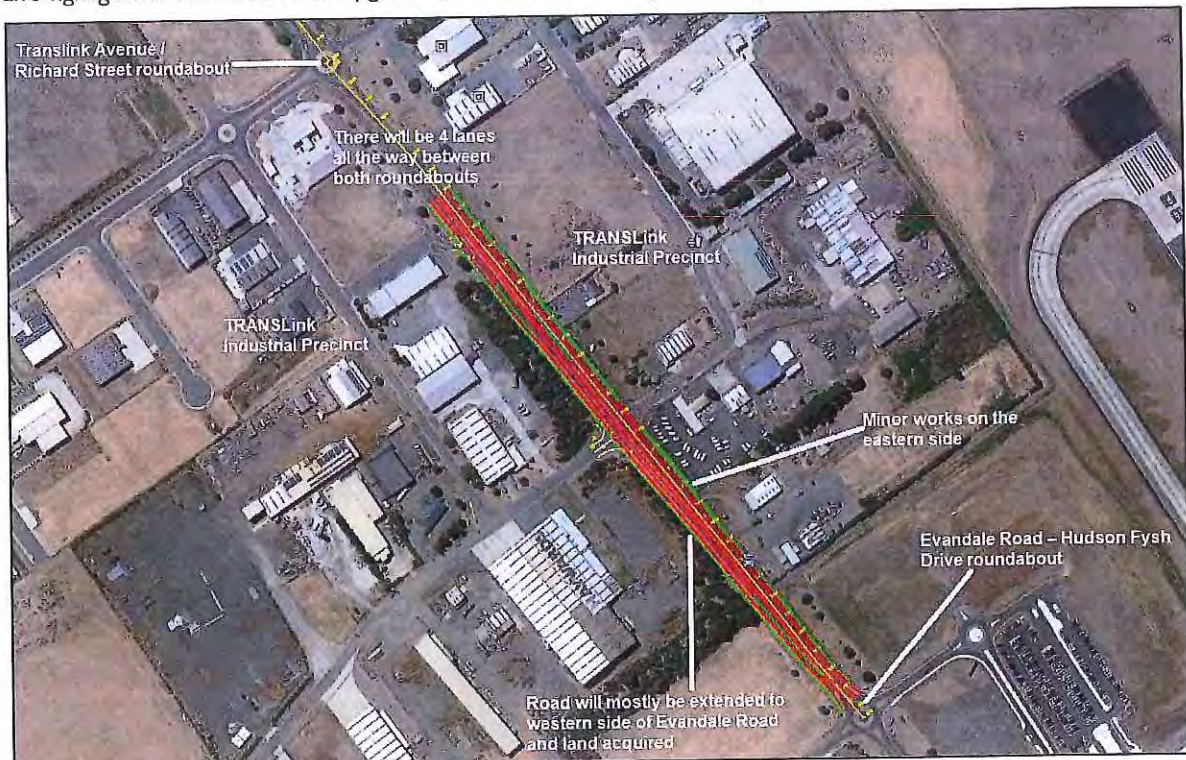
SOUTH-EAST SECTION OF THE ROADWORKS
